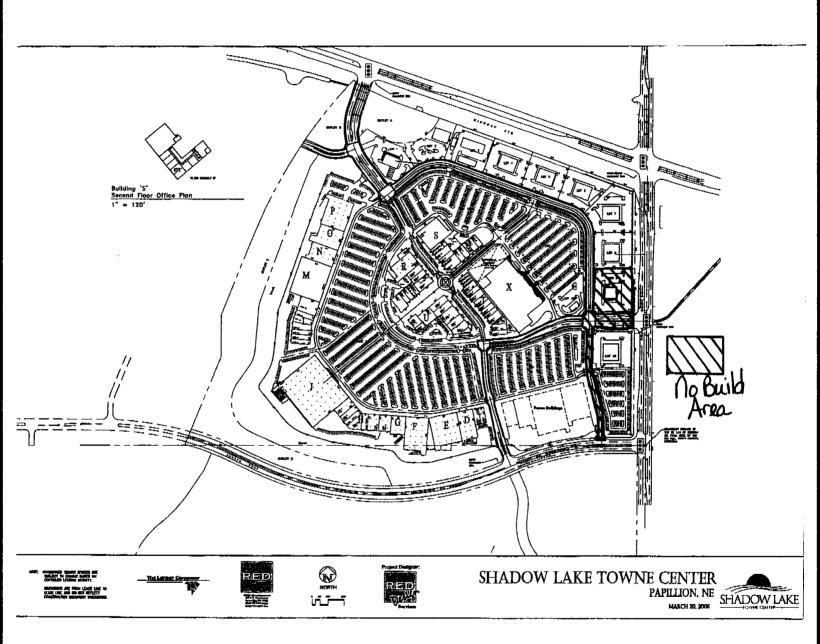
EXHIBIT A SITE PLAN – PAGE 2 OF 3
